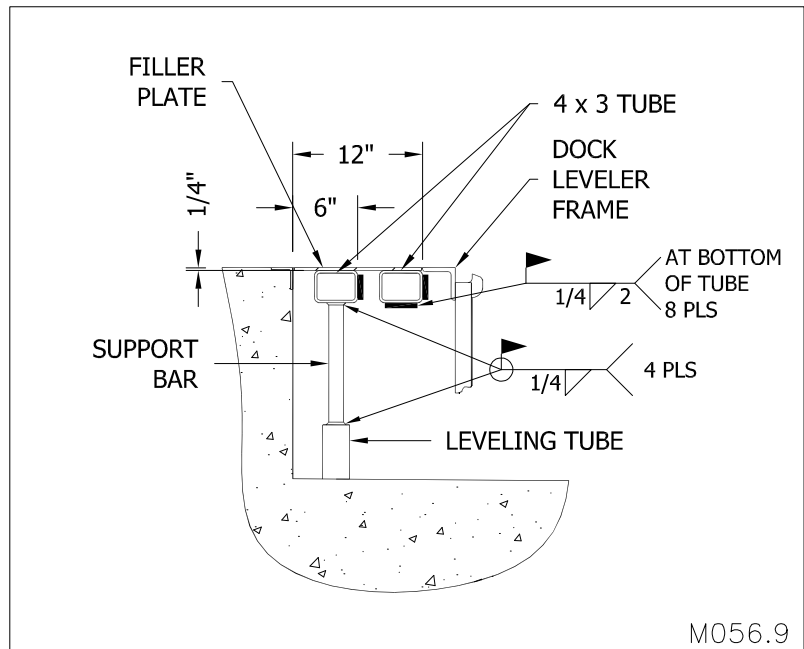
Welding the 4 X 3 Rectangular Tubing to the Curb Angles
